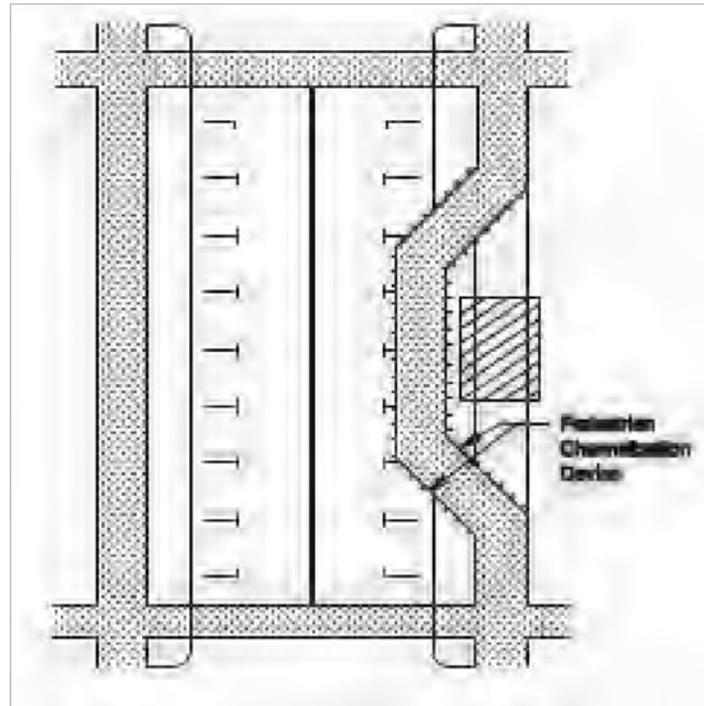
Roadway Sidewalk Diversion for Low Speed Roads (< 40 mph)
